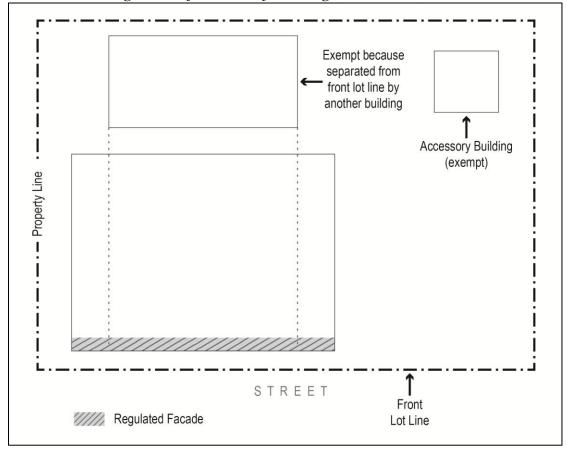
Regulated façades for Façade Design, Articulation, and Window Standards.
